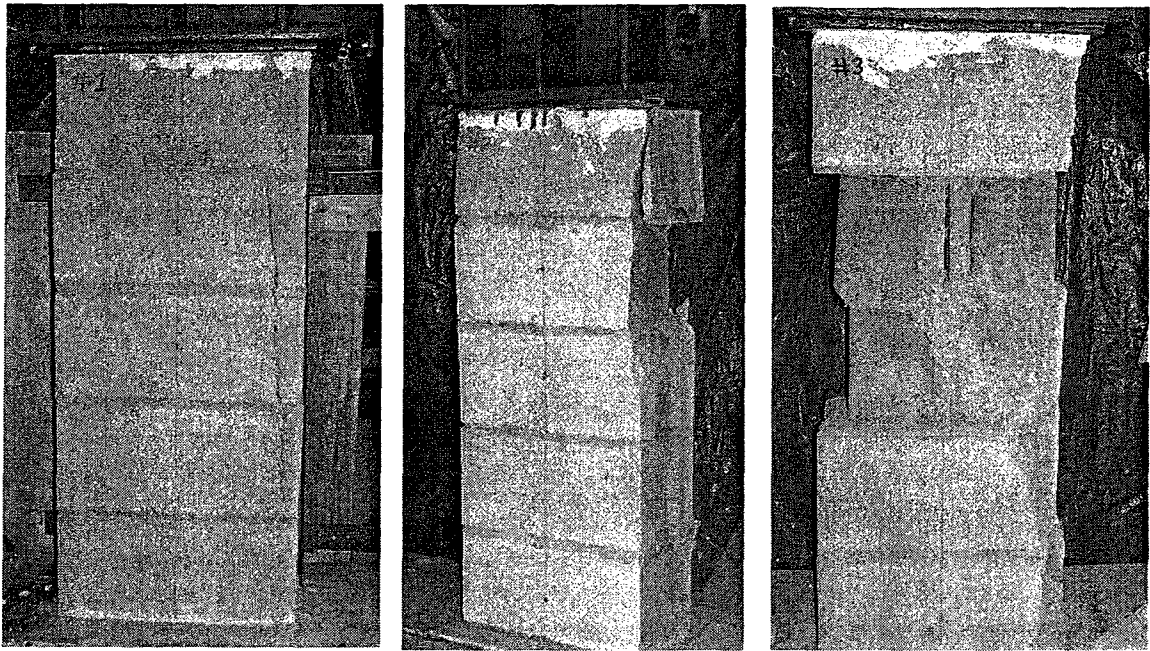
Compressive masonry prisms loaded normal to their bed joints after failure
